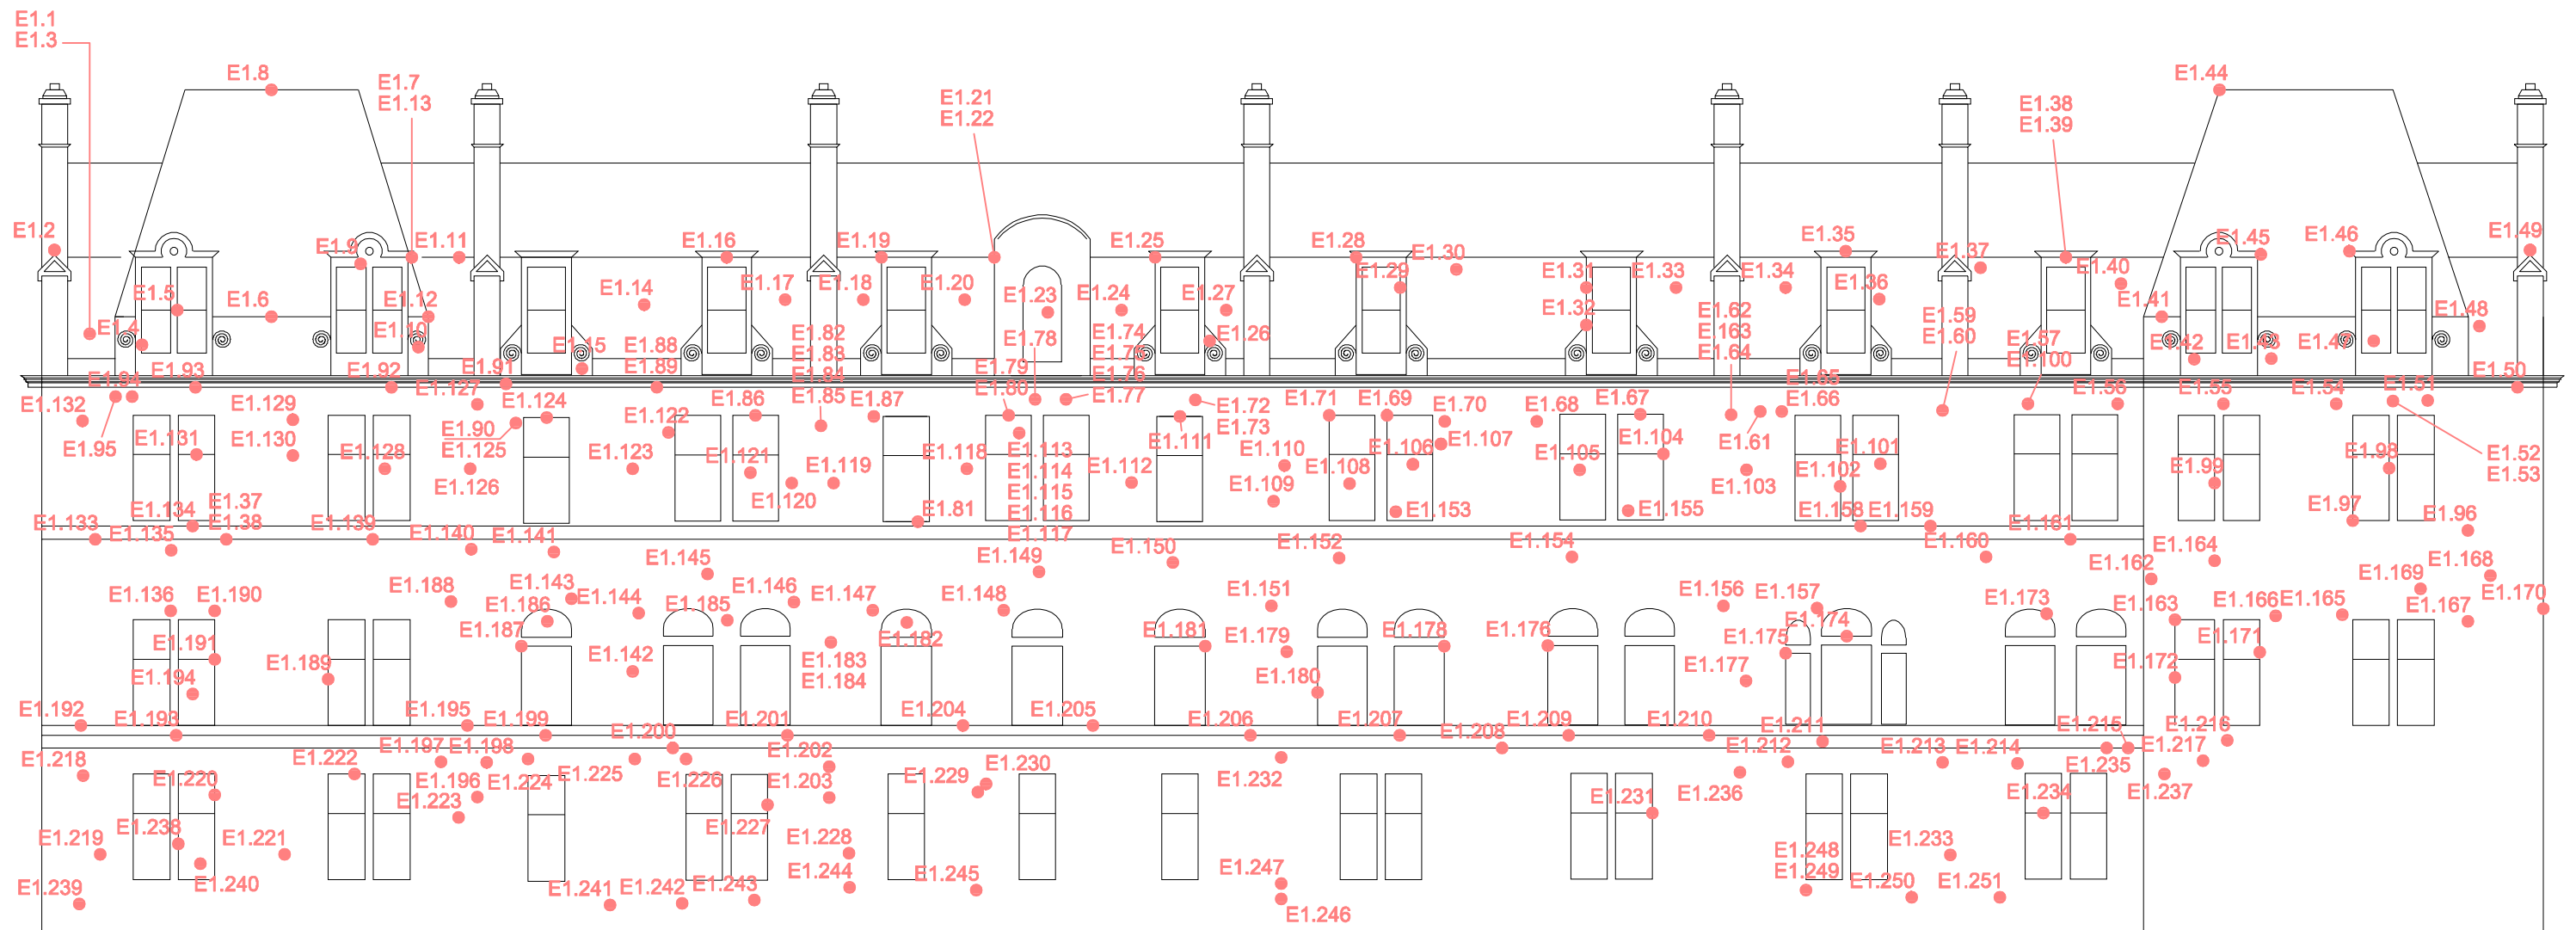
Elevation E1 of Station Hotel Building showing Defect/Observation Locations
